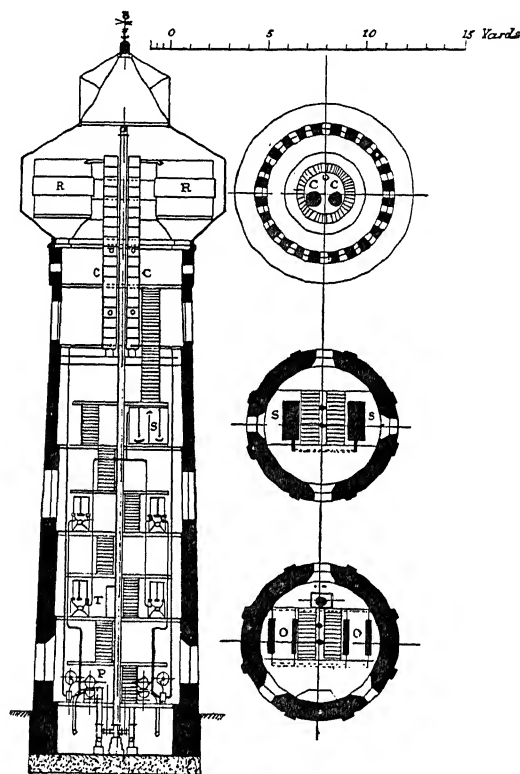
STERILIZING TOWER AT GINNEKIN, HOLLAND.
